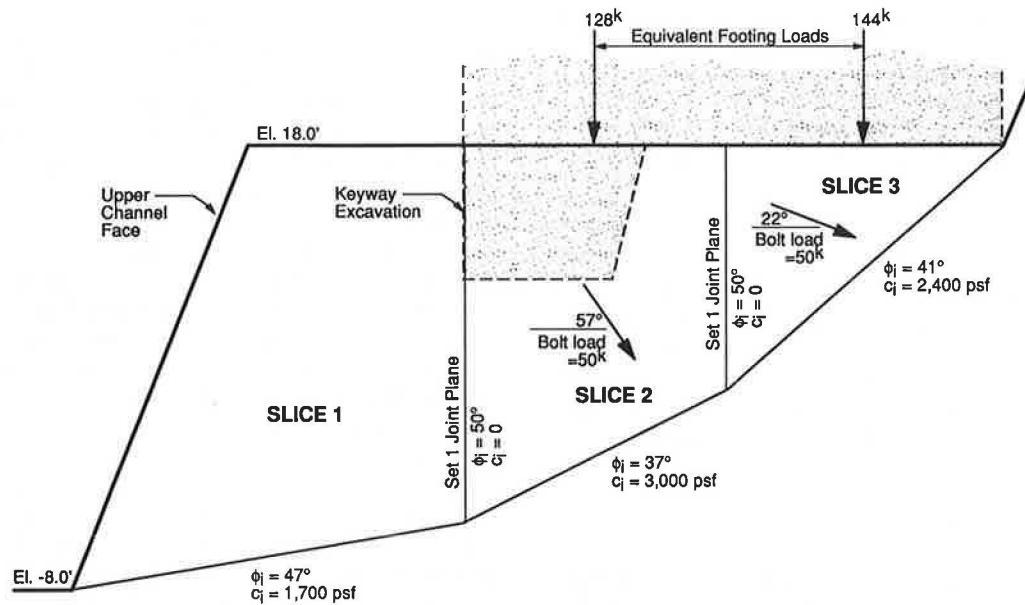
Conditions for Sarma analyses of potential general failure beneath footing (loads shown are for 1-ft-thick slice; Set 1 joint planes assumed as interior slip surfaces at 90-degree dip).
